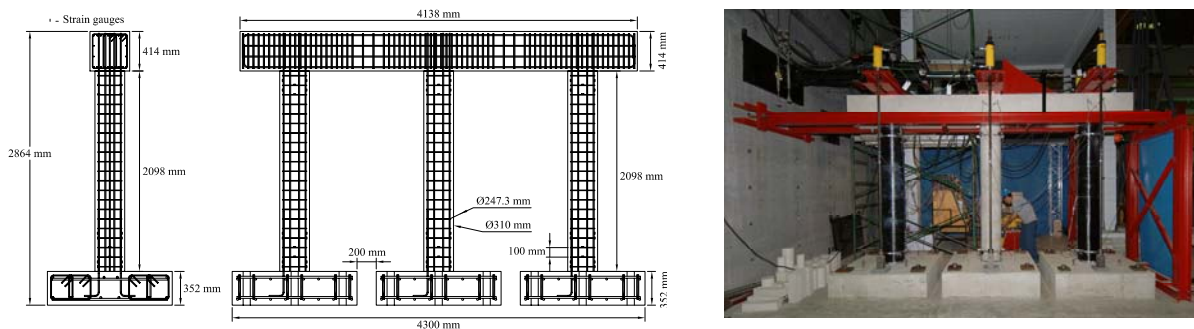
Reinforcement details and instrumentation and as-built bridge bent specimen.
